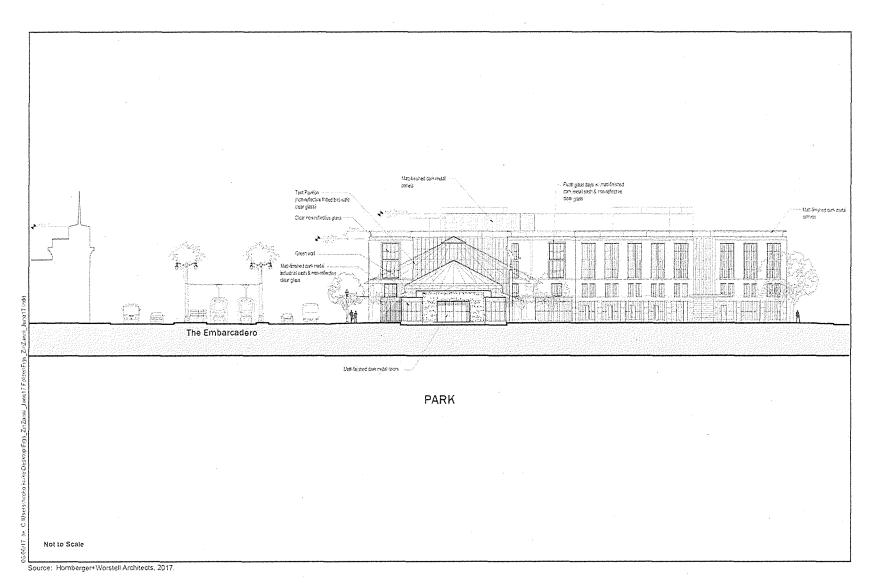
PROPOSED ELEVATION – SOUTH, PROPOSED PUBLIC PARK
